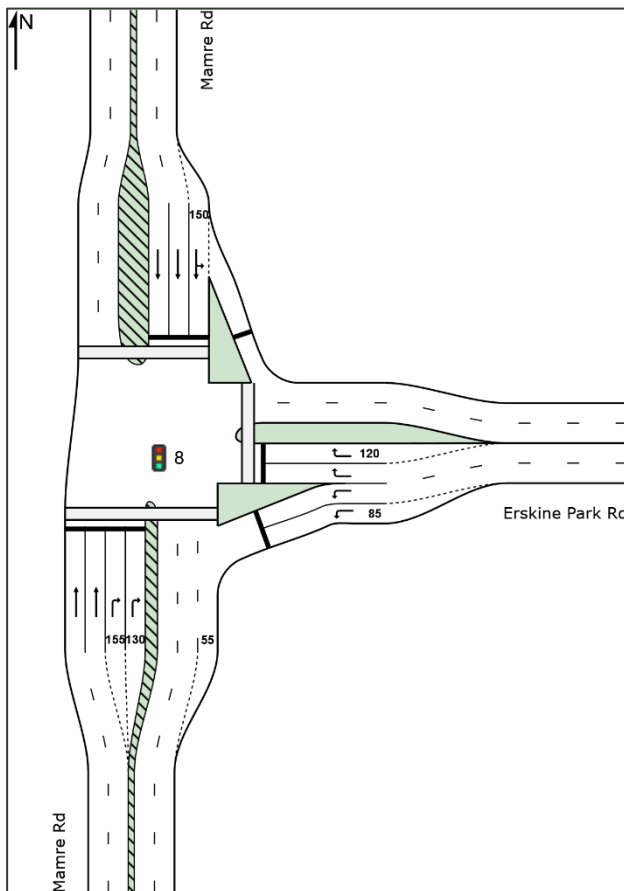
2026 & 2036 Mamre Road & Erskine Park Road intersection
